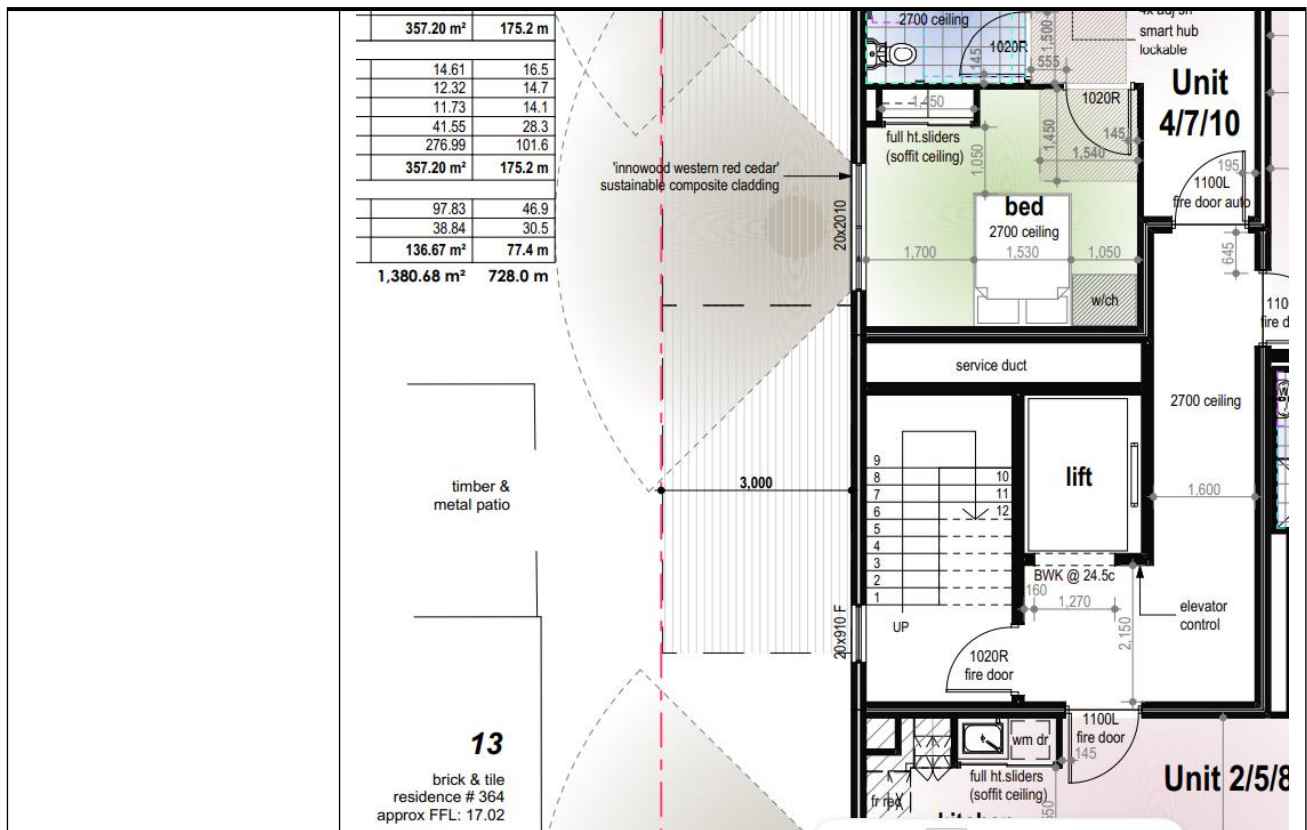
Extract of Floor Plan indicating the cone of vision encroachment
